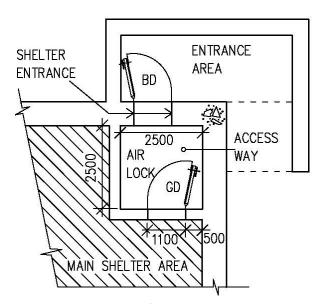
Plan - Typical Layout Of A Standard Shelter Entrance With Air Lock
